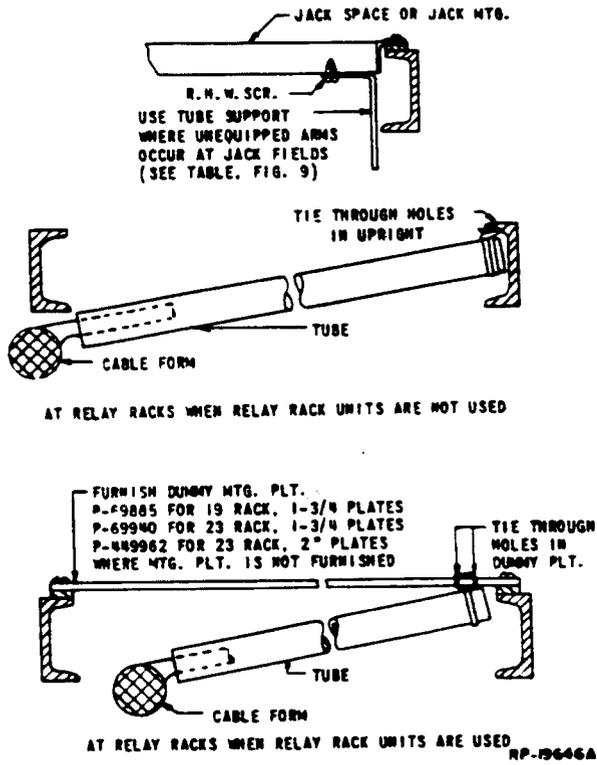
SUPPORTING COMPLETELY UNEQUIPPED HORIZONTAL CABLE FORMS AT RELAY RACKS (PAR. 2.52)
